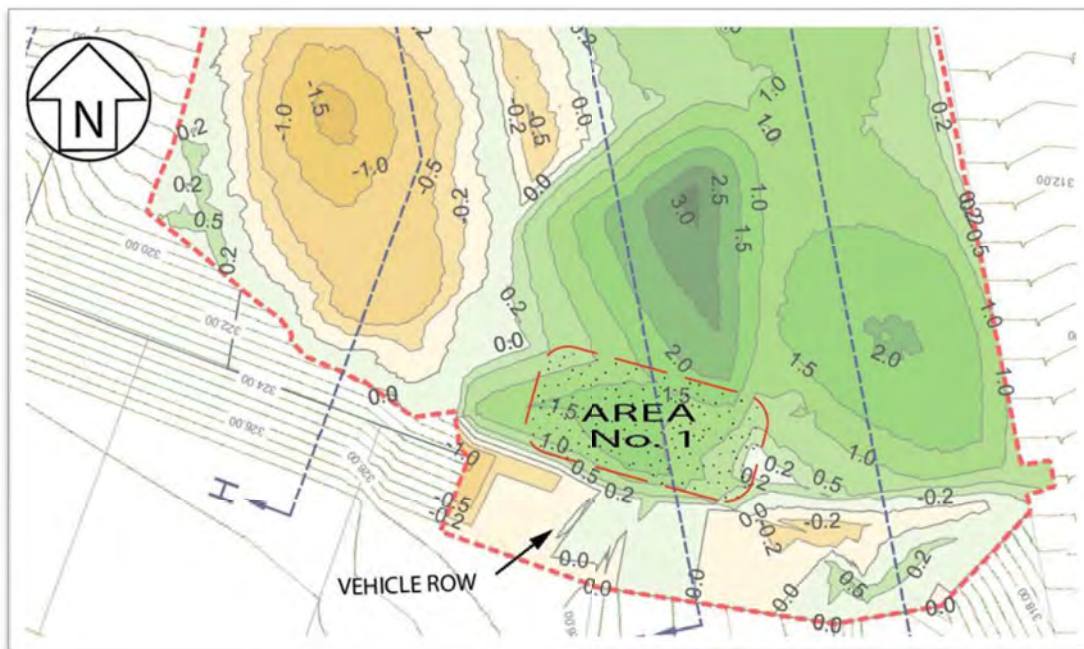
General location of engineered fill under construction relative to proposed earthworks plan
